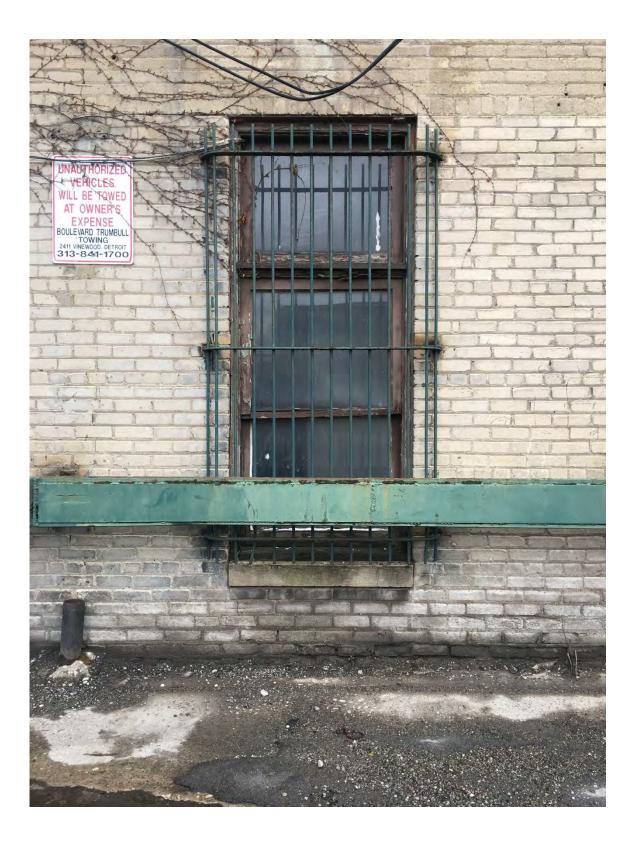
Exterior, North Façade, Looking South. 5/1/2019
